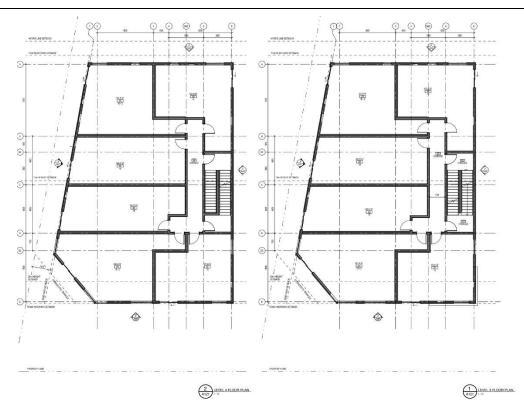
Level 3 Floor Plan (L) and Level 2 Floor plan (R)
